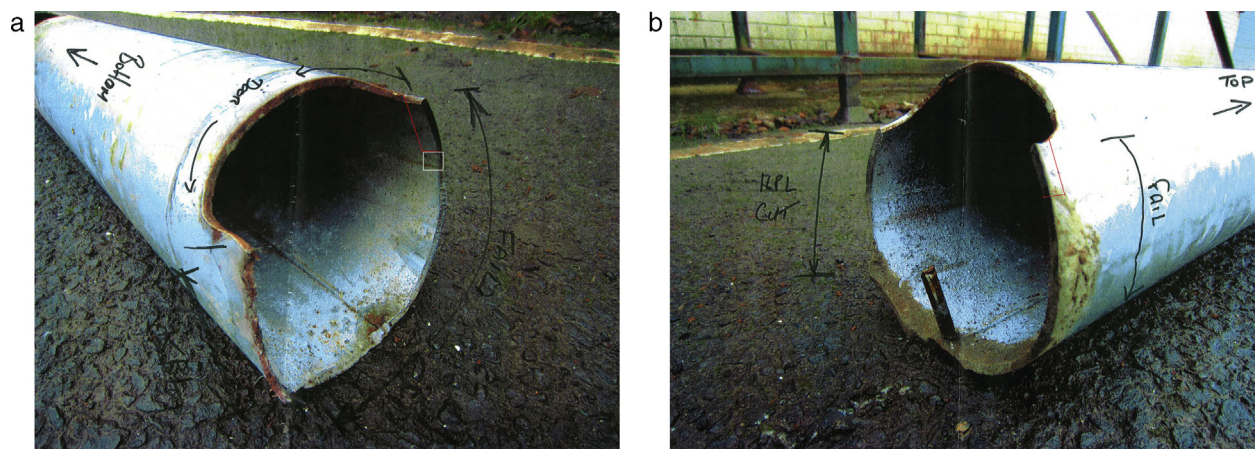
Tubes cut from (a) the bottom and (b) the top parts of the damaged post (optical macro photographs of the regional fracture surfaces courtesy of the Department for Regional Development in Northern Ireland). The failed portion is labelled, as is the portion cut subsequently by angle grinder. The sampling locations are shown.
